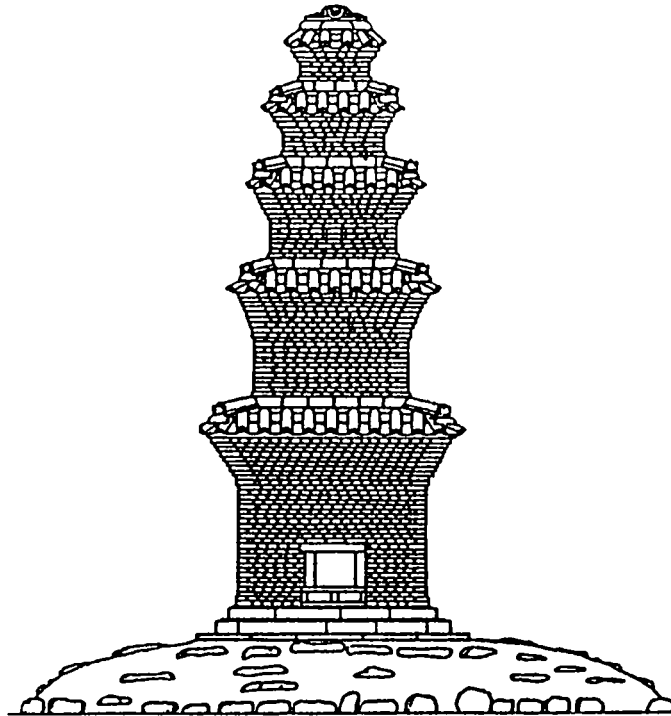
Southern elevation of the brick pagoda of Bŏb-rim-sa 法林寺 법림사 (Ancient Sin-la ?, later reconstructions, scale: 1 : 100) (after: *KCZS* 1934.7., p. 3)
